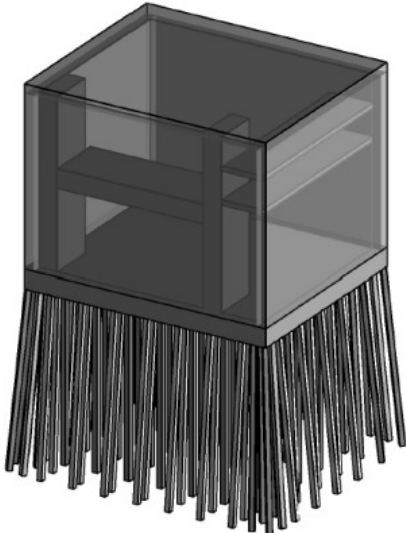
Foundation: 88 prefab concrete piles (NAP -27 m); footprint 22 × 27 m [34]
